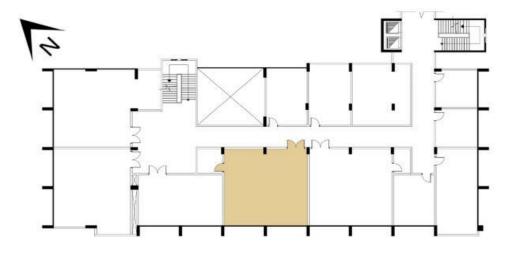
Typical floor plan showing a study area at the Arab Academy for Science and Technology, Alexandria Governorate (Samaan, Farag, & Khalil, 2018)
